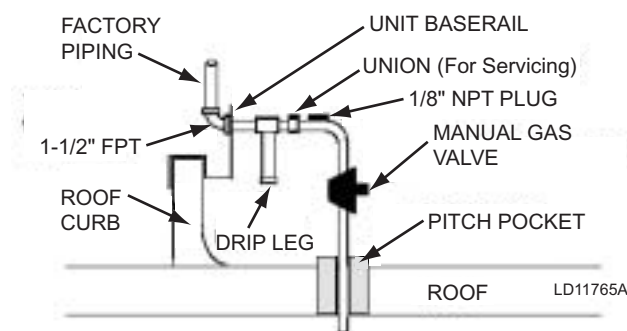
TYPICAL GAS PIPING CONNECTION
